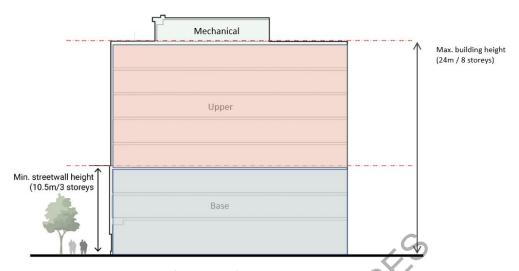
Mid-rise building type (3-8 storeys): no setbacks are required, but where they are provided, the base building must be a minimum of 10.5 m tall.
